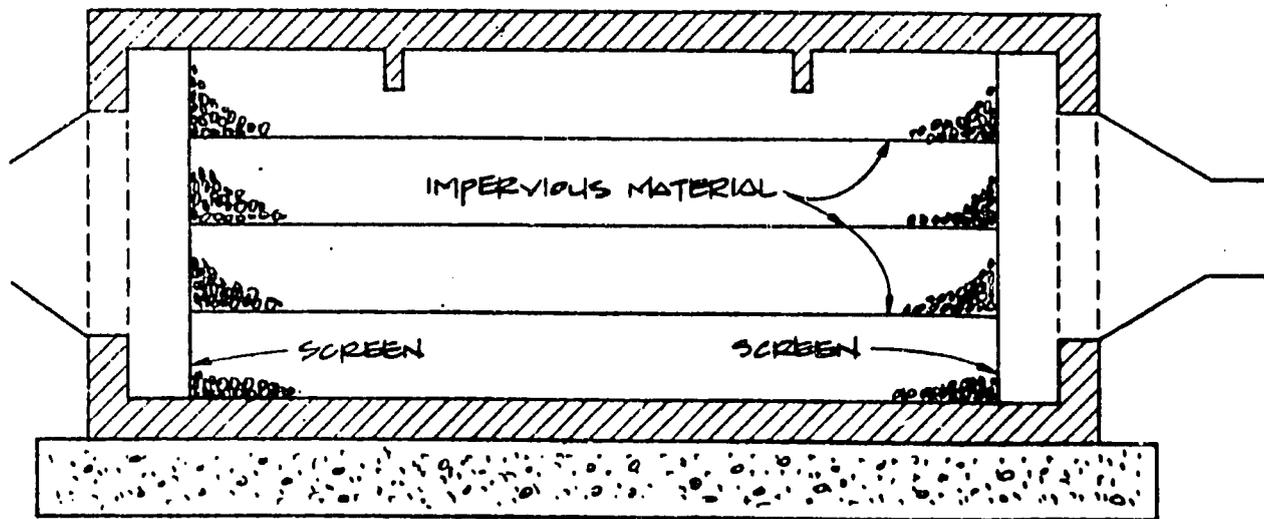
Horizontal Flow Rock Bed (Alternative 2)
